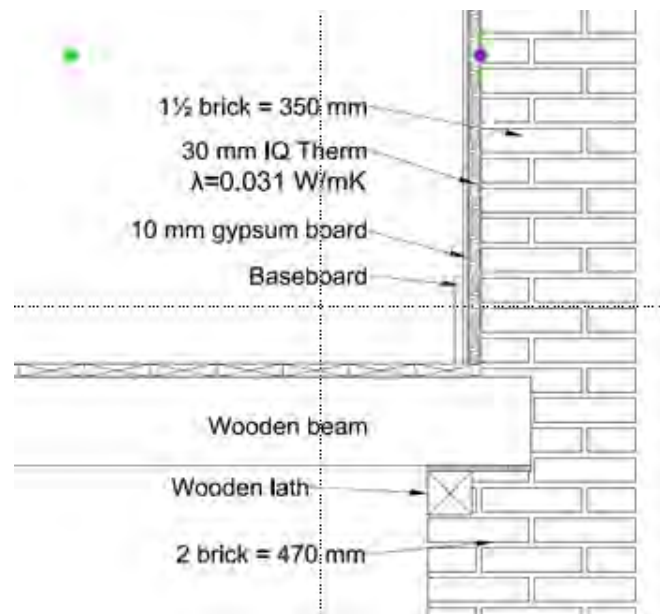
Section of internally insulated facade at Thomas Laubs Gade 5
